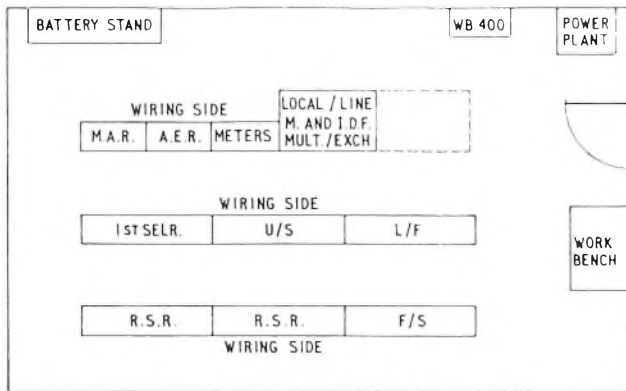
TYPICAL LAYOUT FOR 400-LINE S.A.X. IN A B1 TIMBER BUILDING
